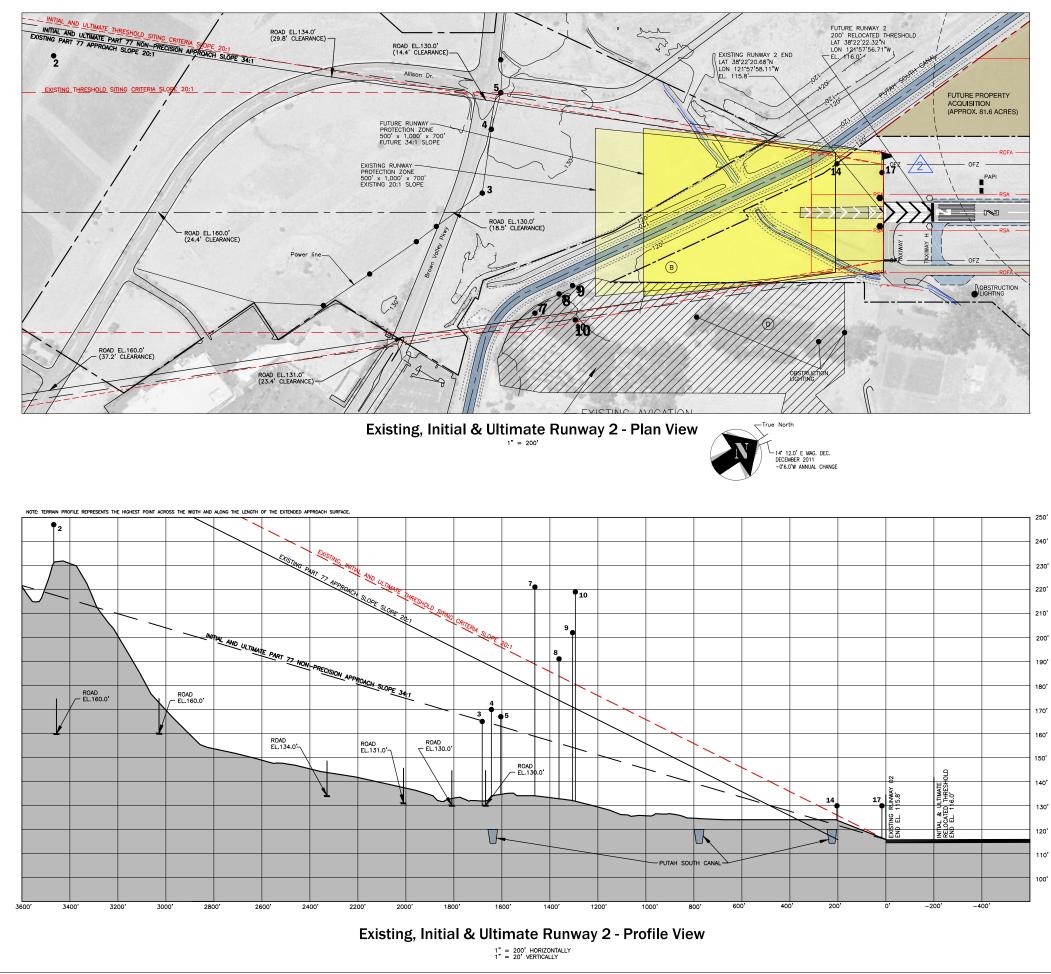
Inner Portion of the Approach Surface Plan, Runway 2 (Plan & Profile Views)
